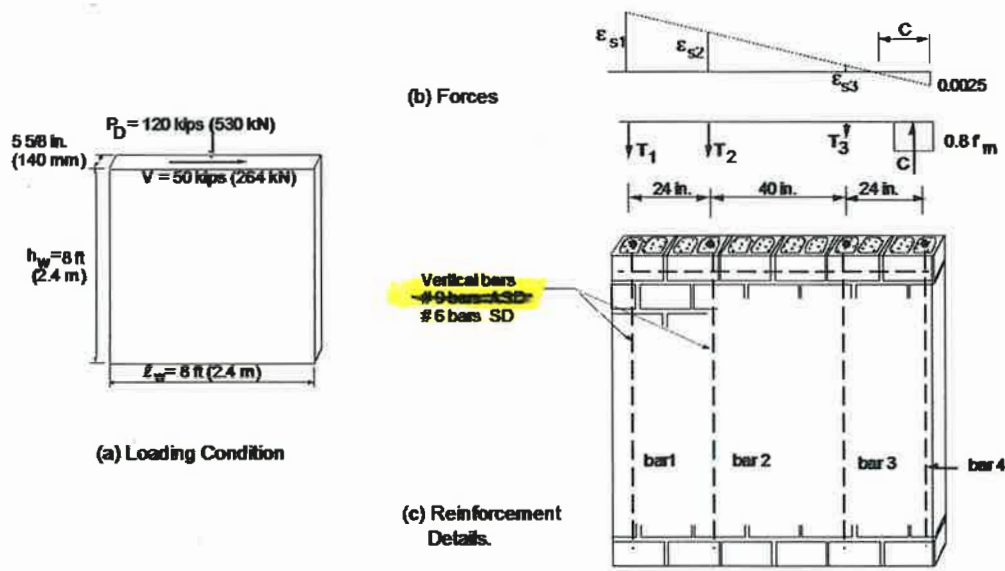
Strength design of masonry shear wall for Example 10.4.
